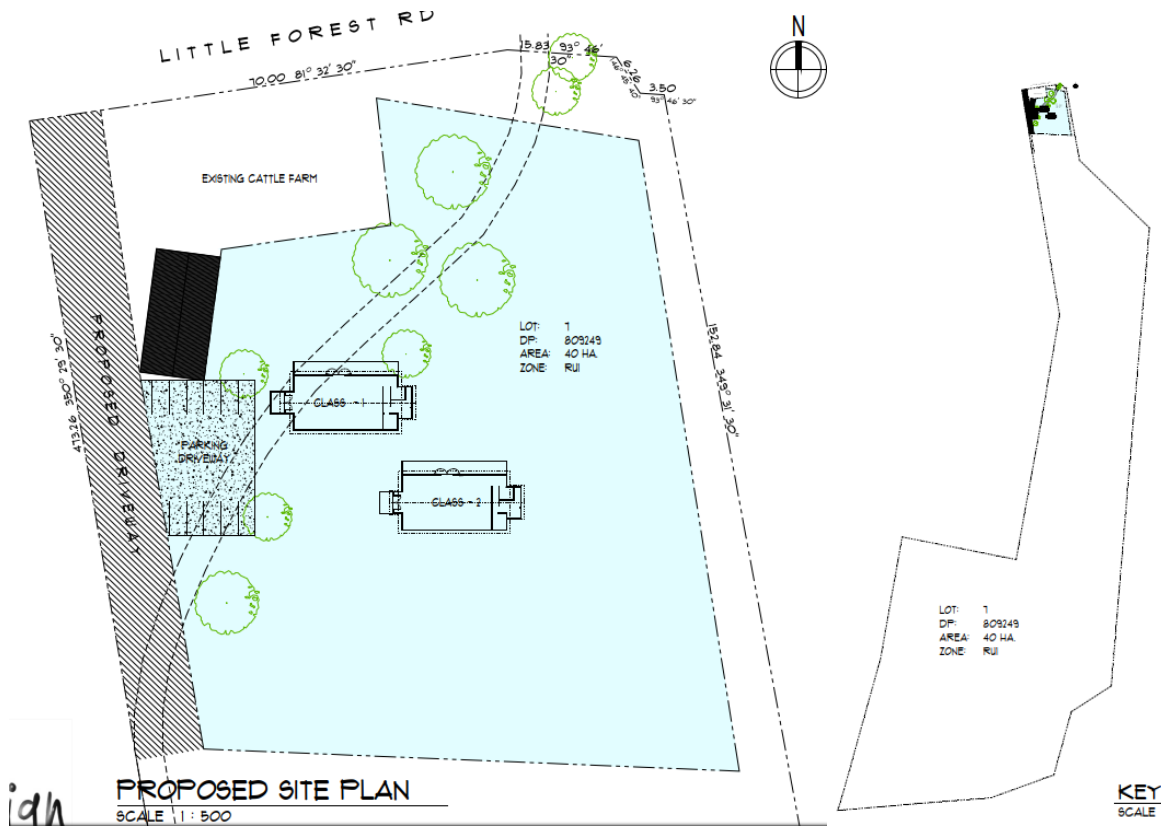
Proposed site plan, and site plan within the Lot context (EcoView Design).
